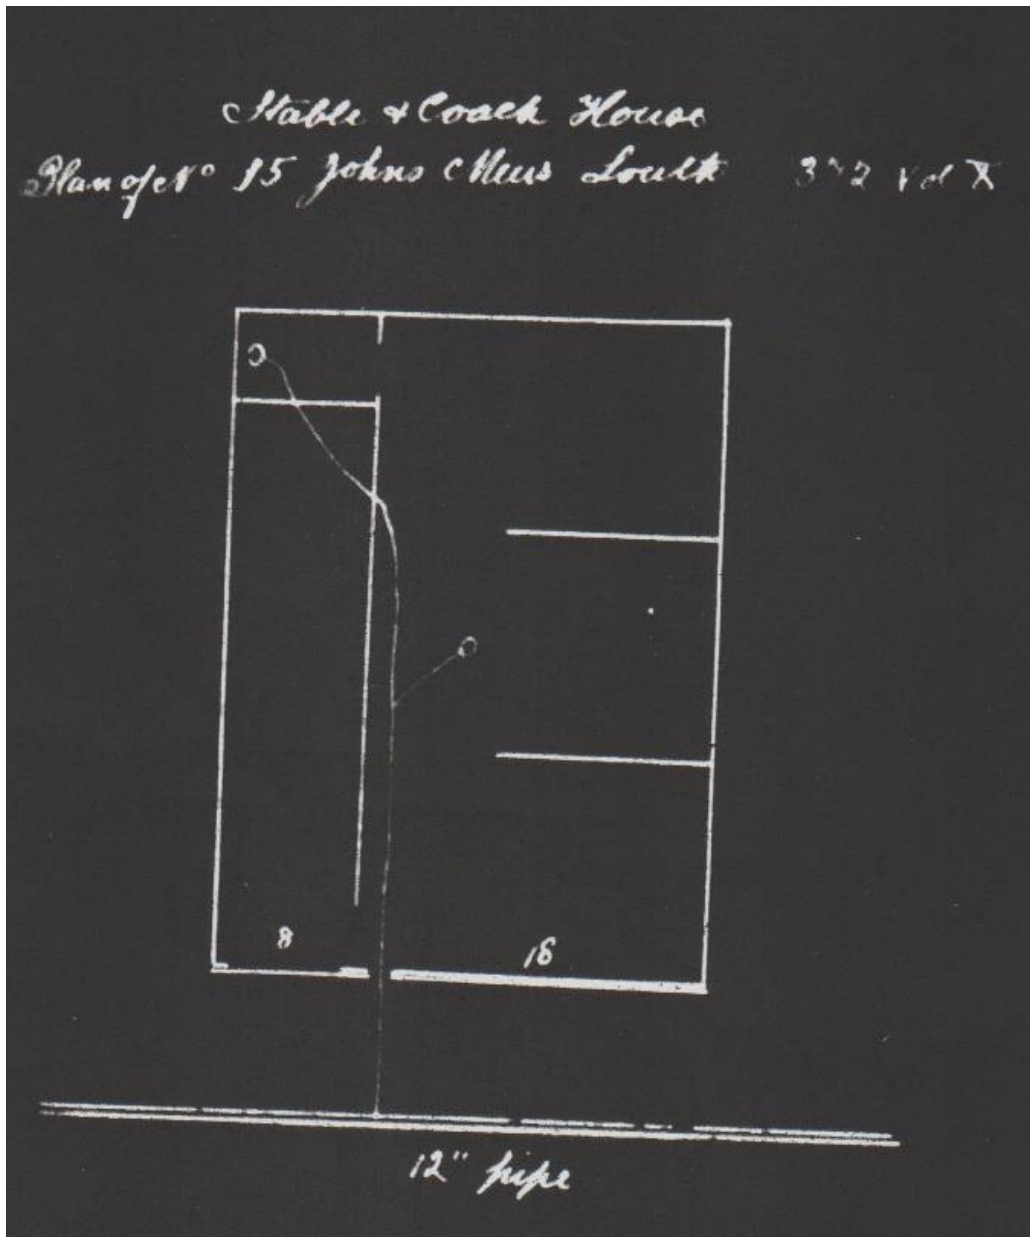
The ground plan of 15 Johns Mews in 1854 (Camden drainage plans)
